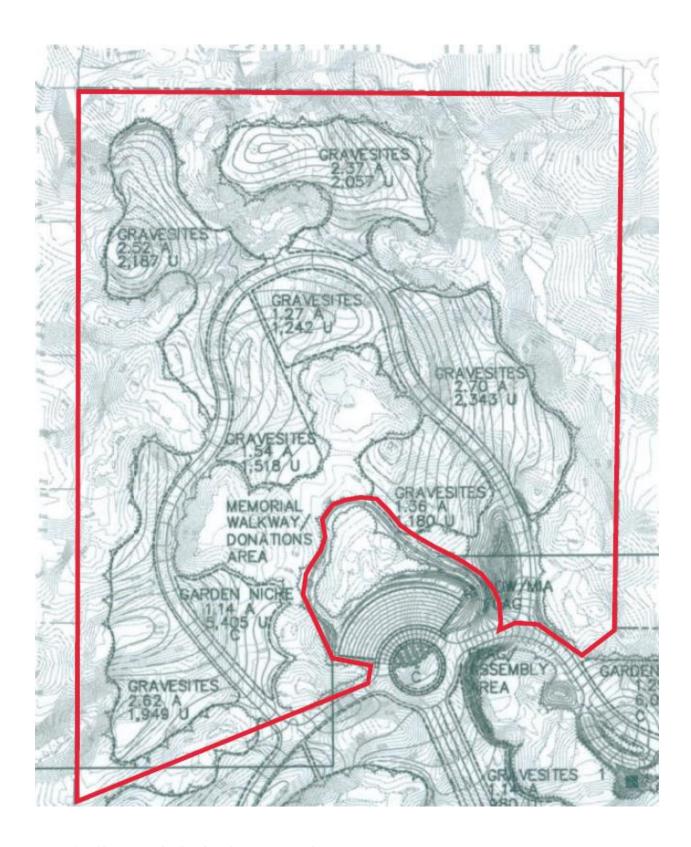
1995 Master Plan for Phase 3 Cemetery Development.
